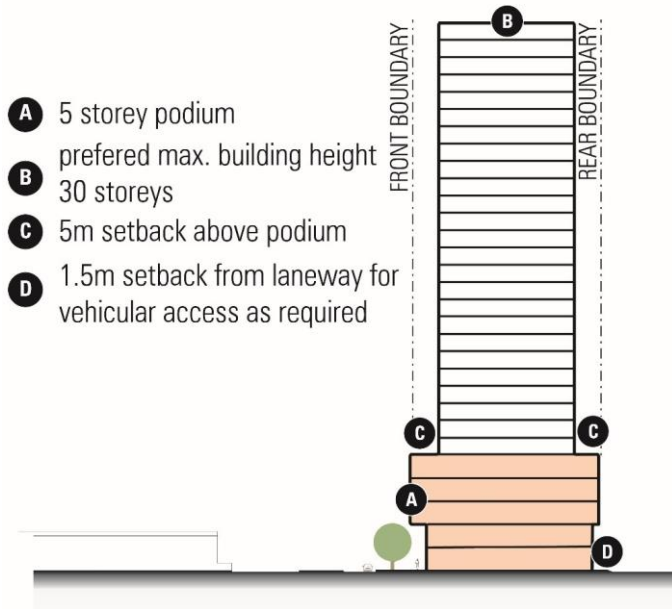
Sub-precinct F5 Illustrative Cross Section
